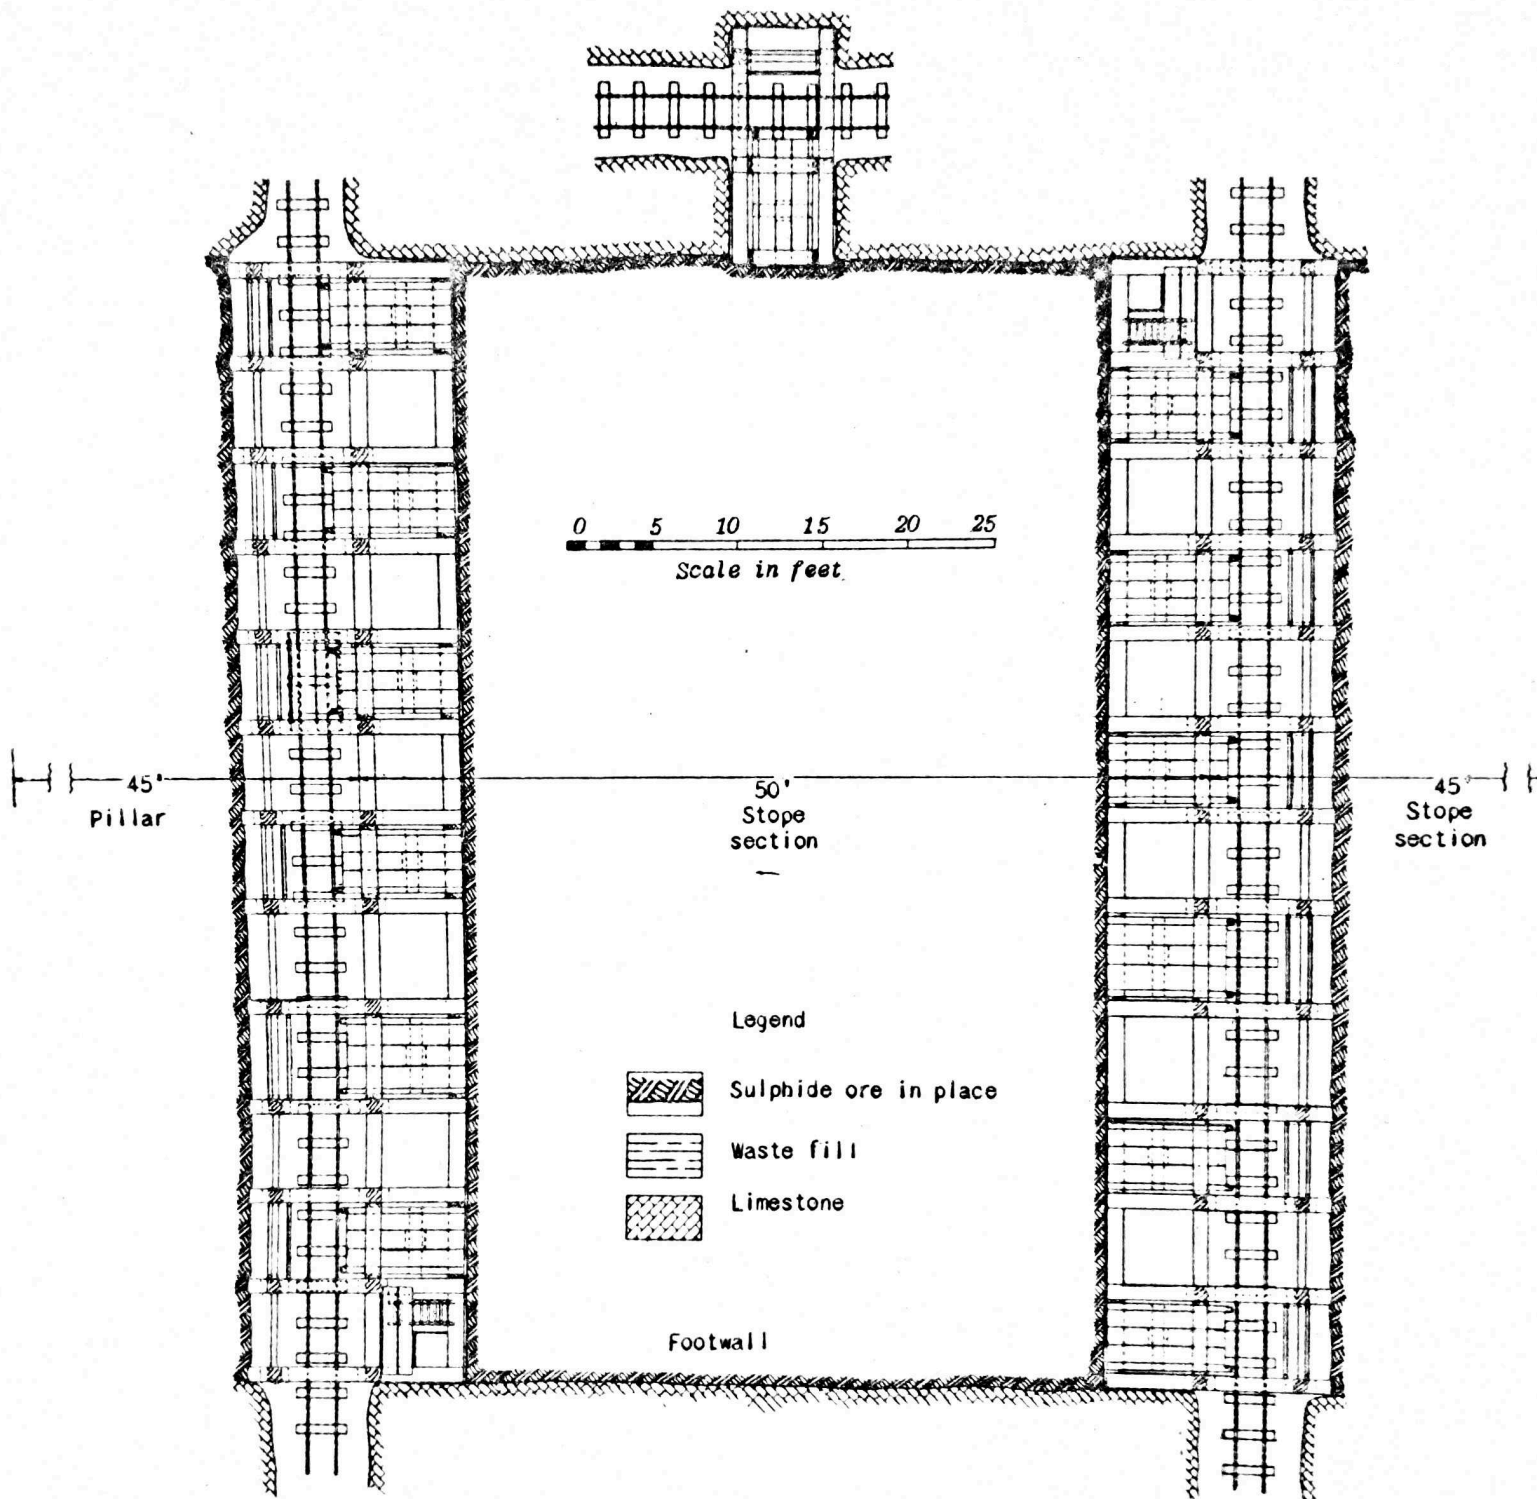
Chute arrangement (plan on B-B, Fig. 4)
